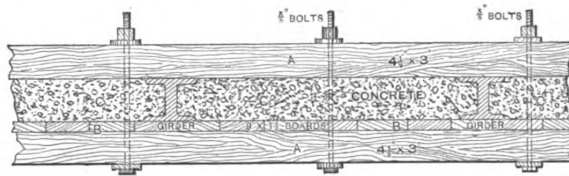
Method of Fixing Timbers or Centering for Concrete Floor.
